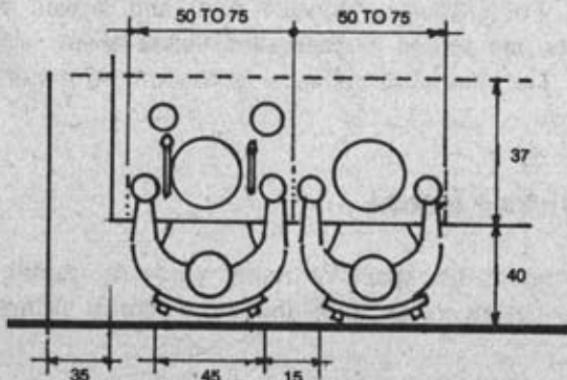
CLEARANCES OF PLACE SETTING
